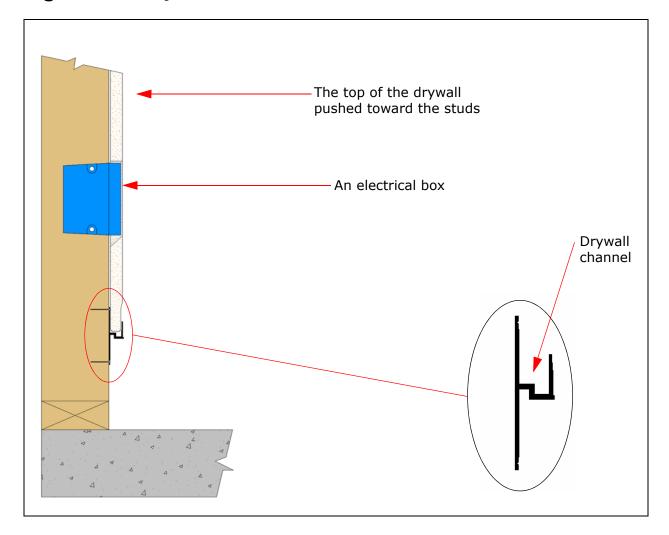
To install drywall, set the sheet of drywall on the UMB, hold the sheet out at the top, use your knee to keep the bottom of the drywall on the drywall channel, and slide the drywall into the drywall channel.
